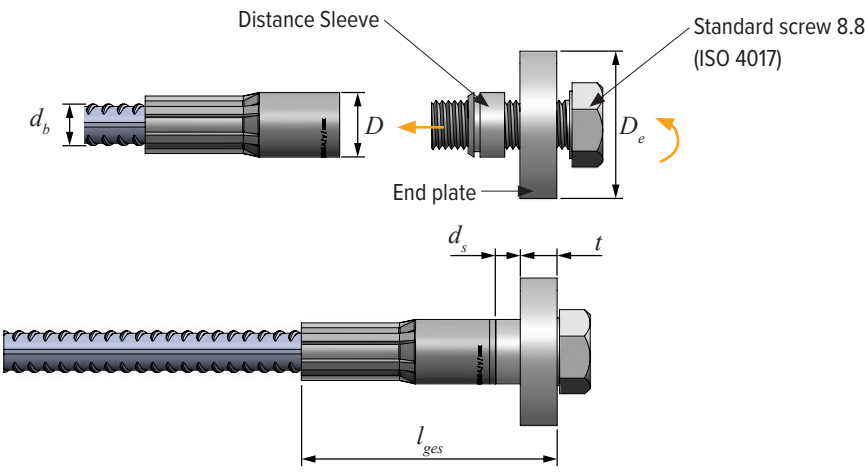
INSTALLATION OF PSB® HEADED ANCHORS ON CONSTRUCTION SITE
